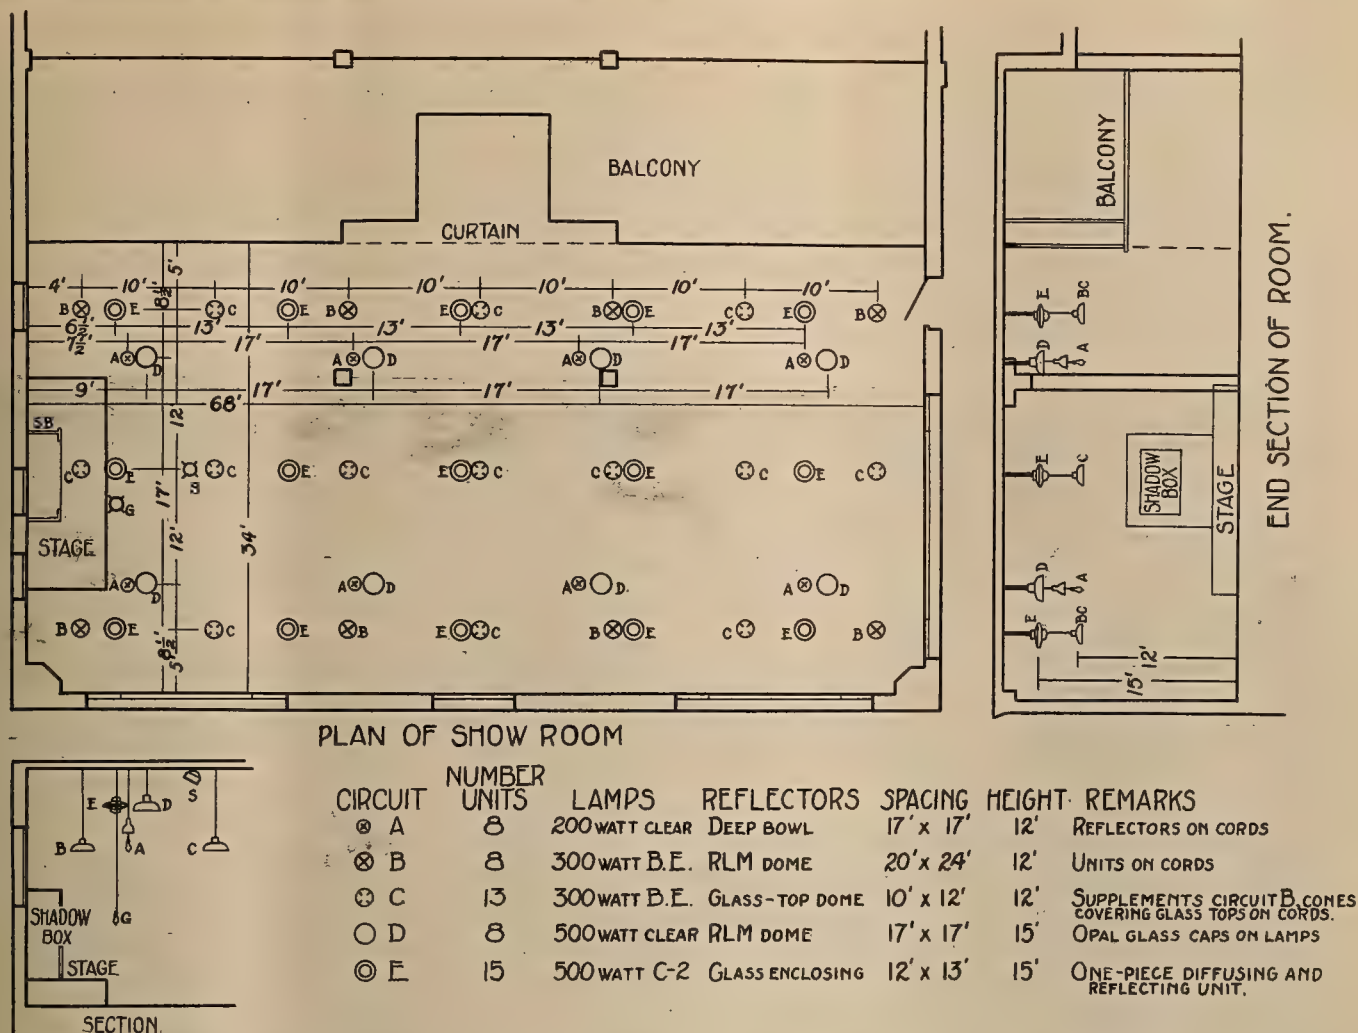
Plan and elevation of Demonstration Room showing lighting layout and type of units employed.
